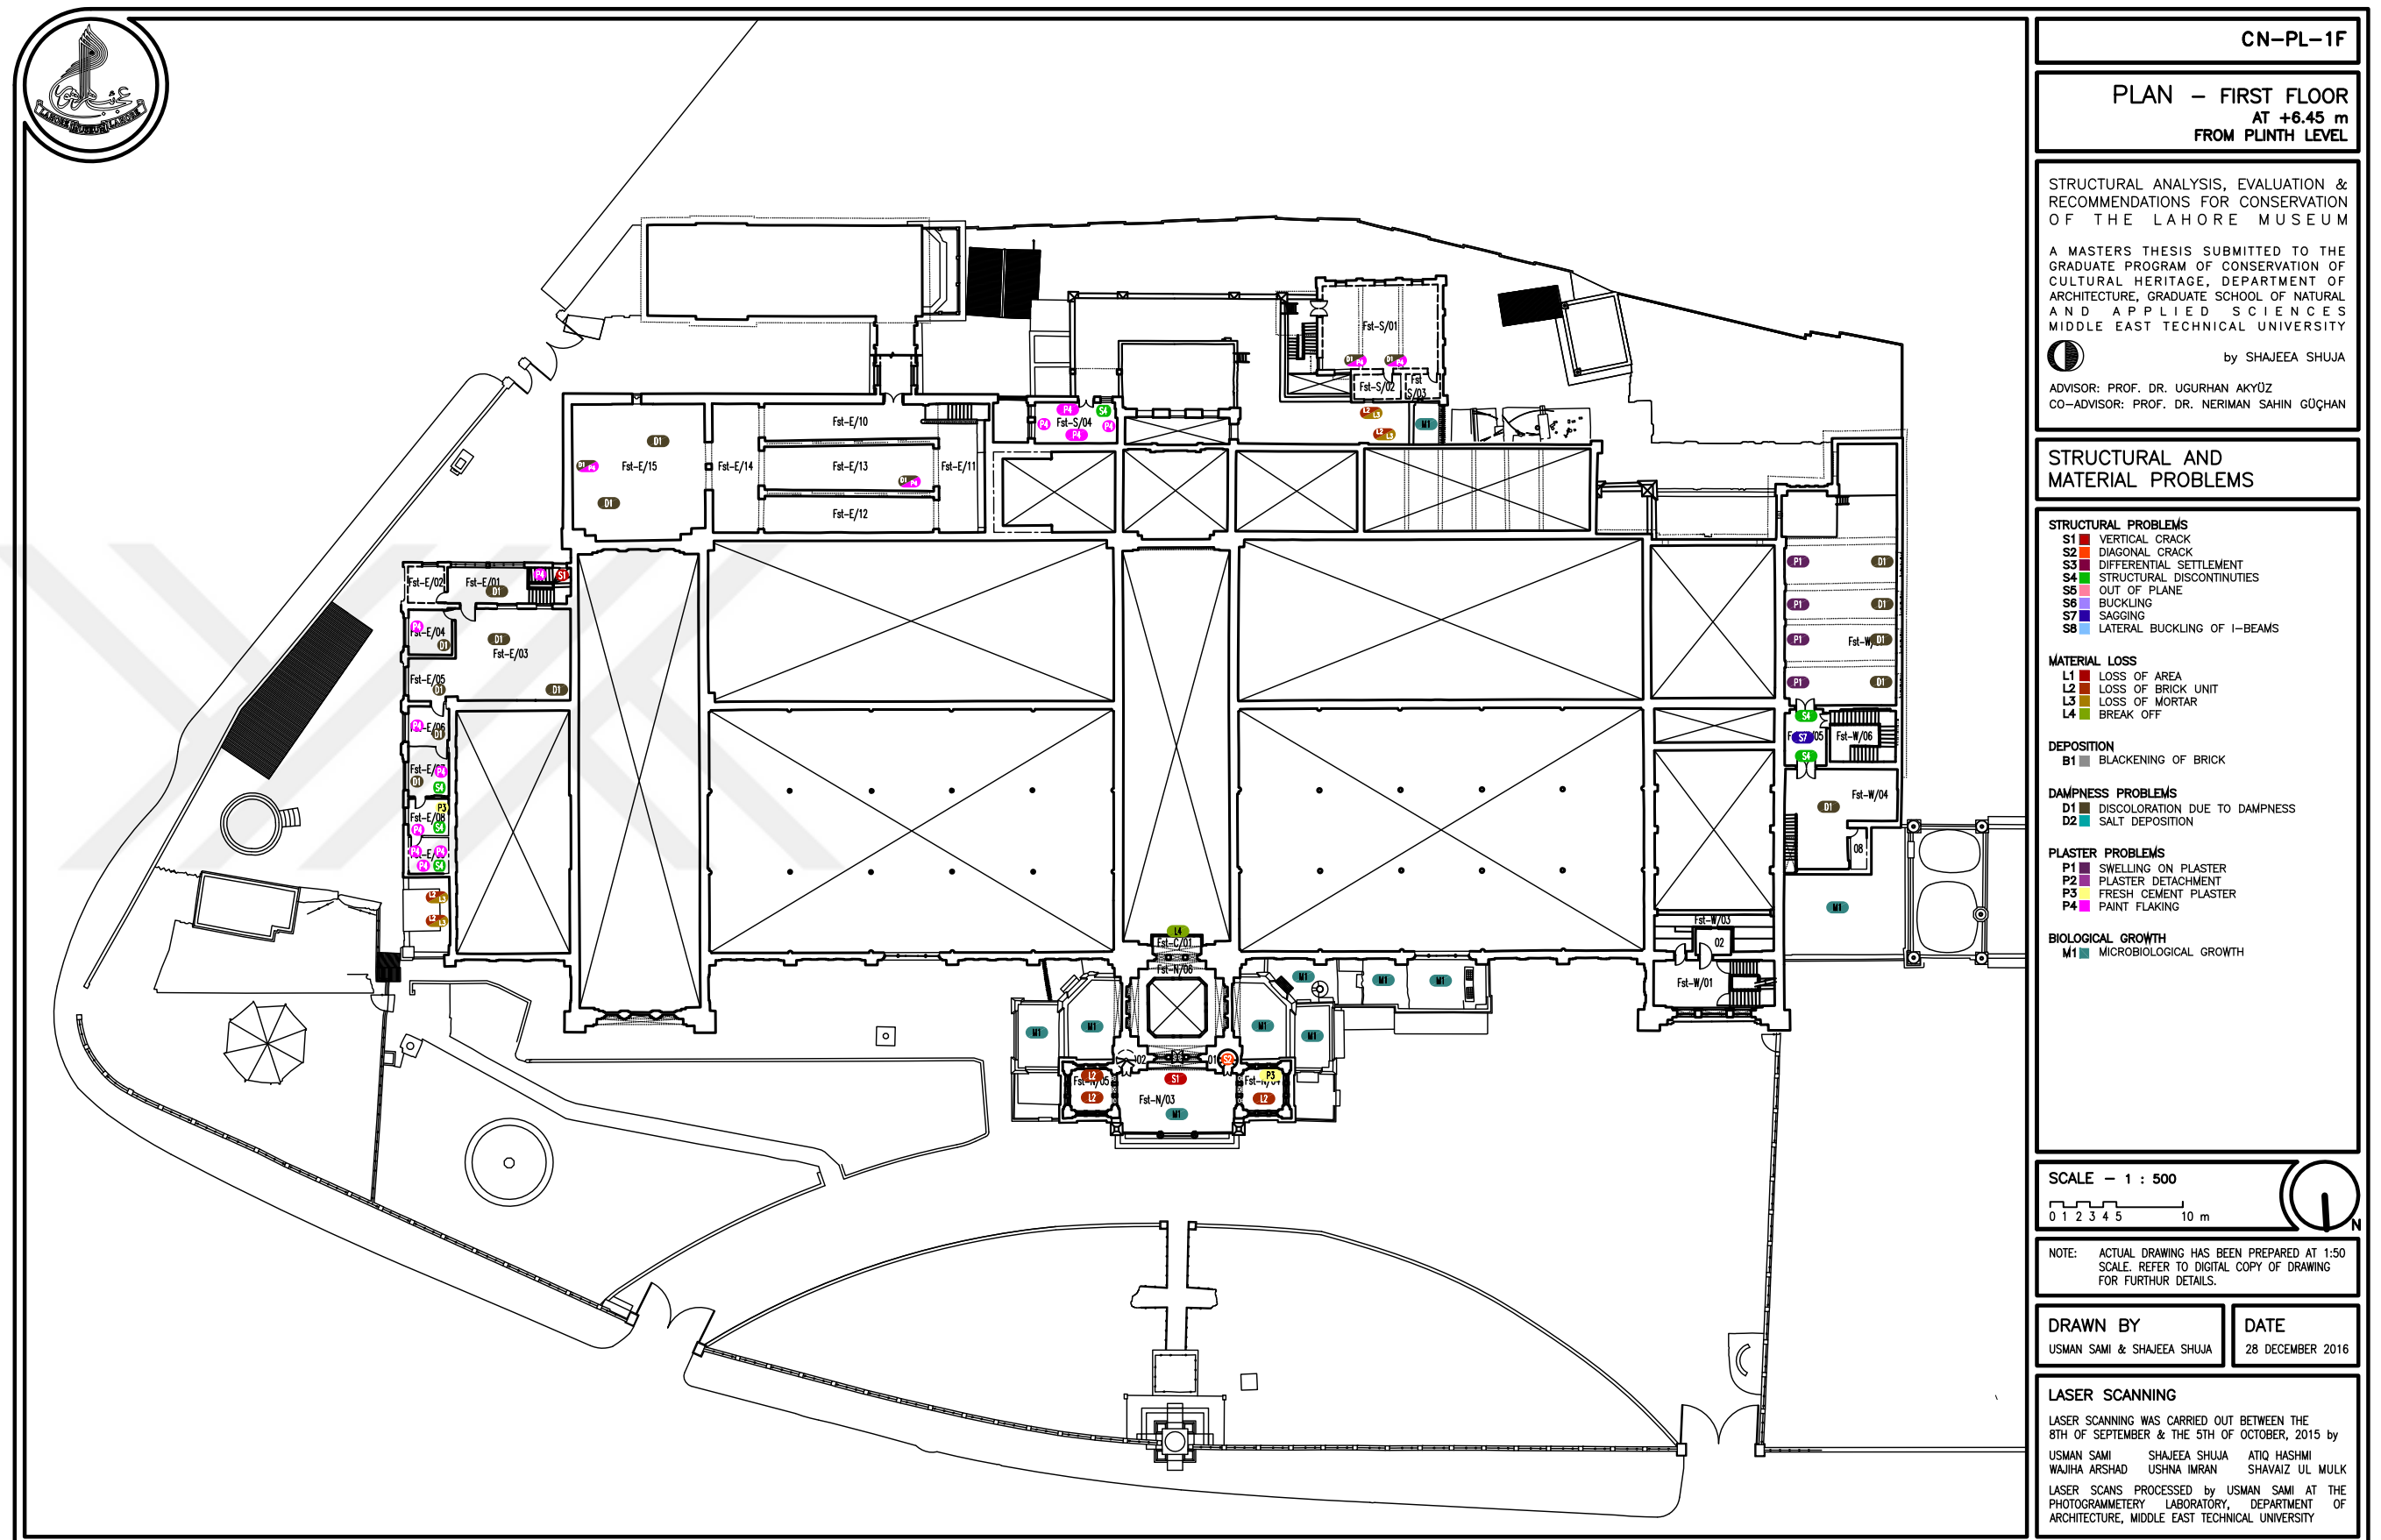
CN-PL-1F – Structural and Material Problems – Plan – First Floor (2016)
